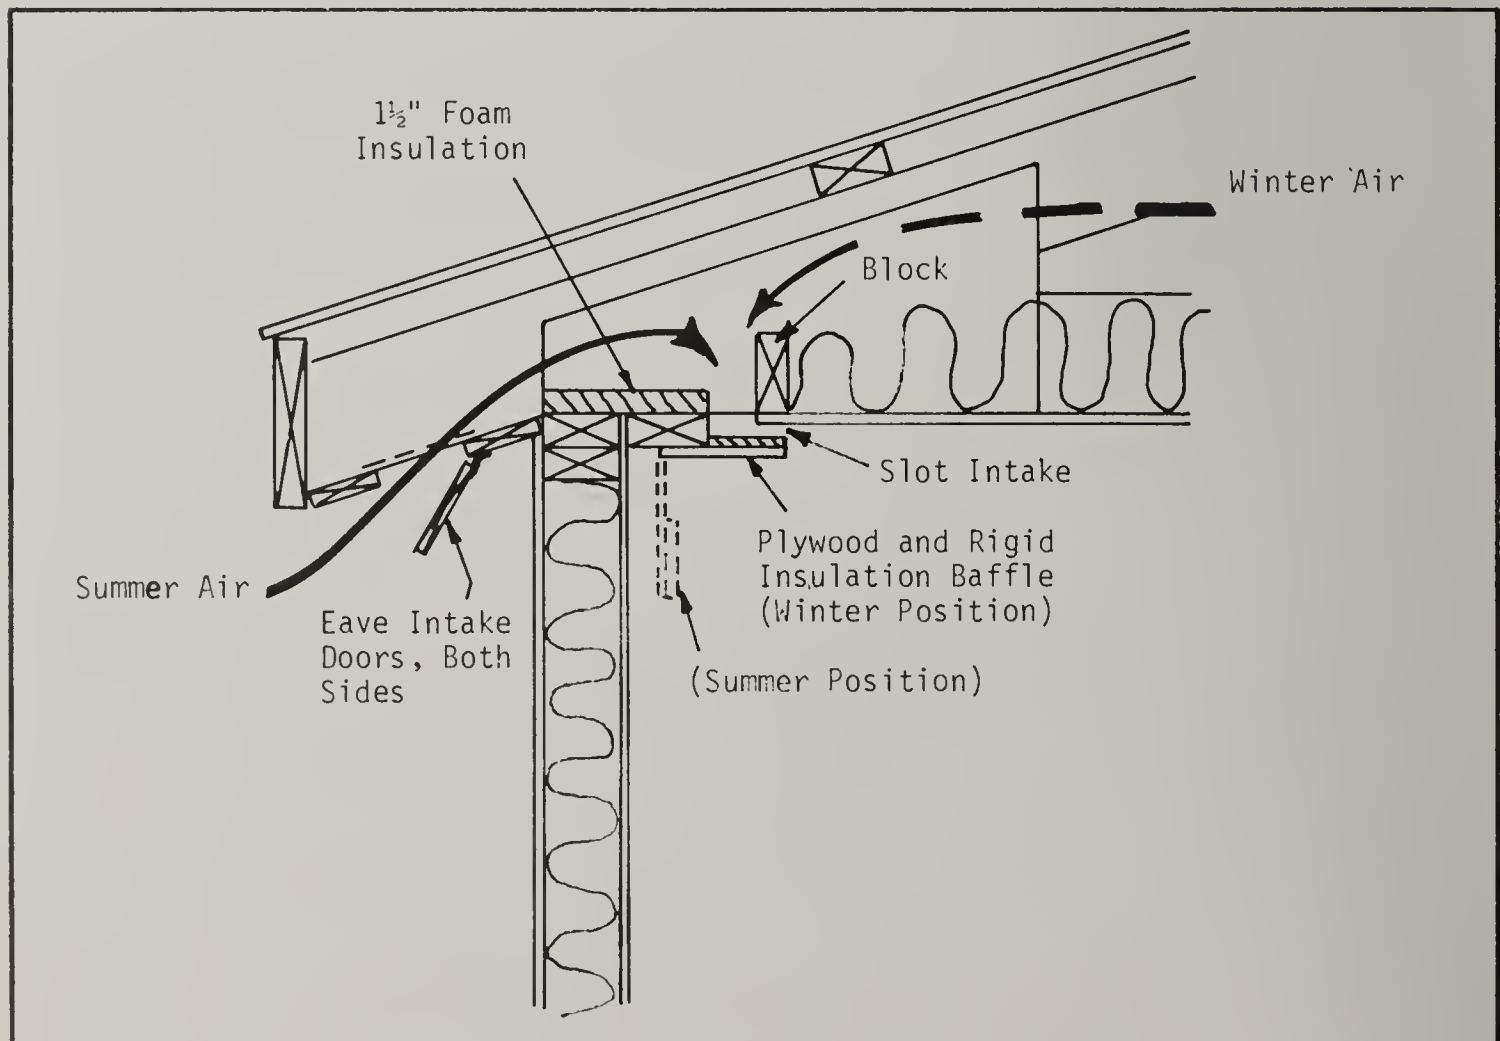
Typical eave and baffled slot intake. Source: Midwest Plan Service.
